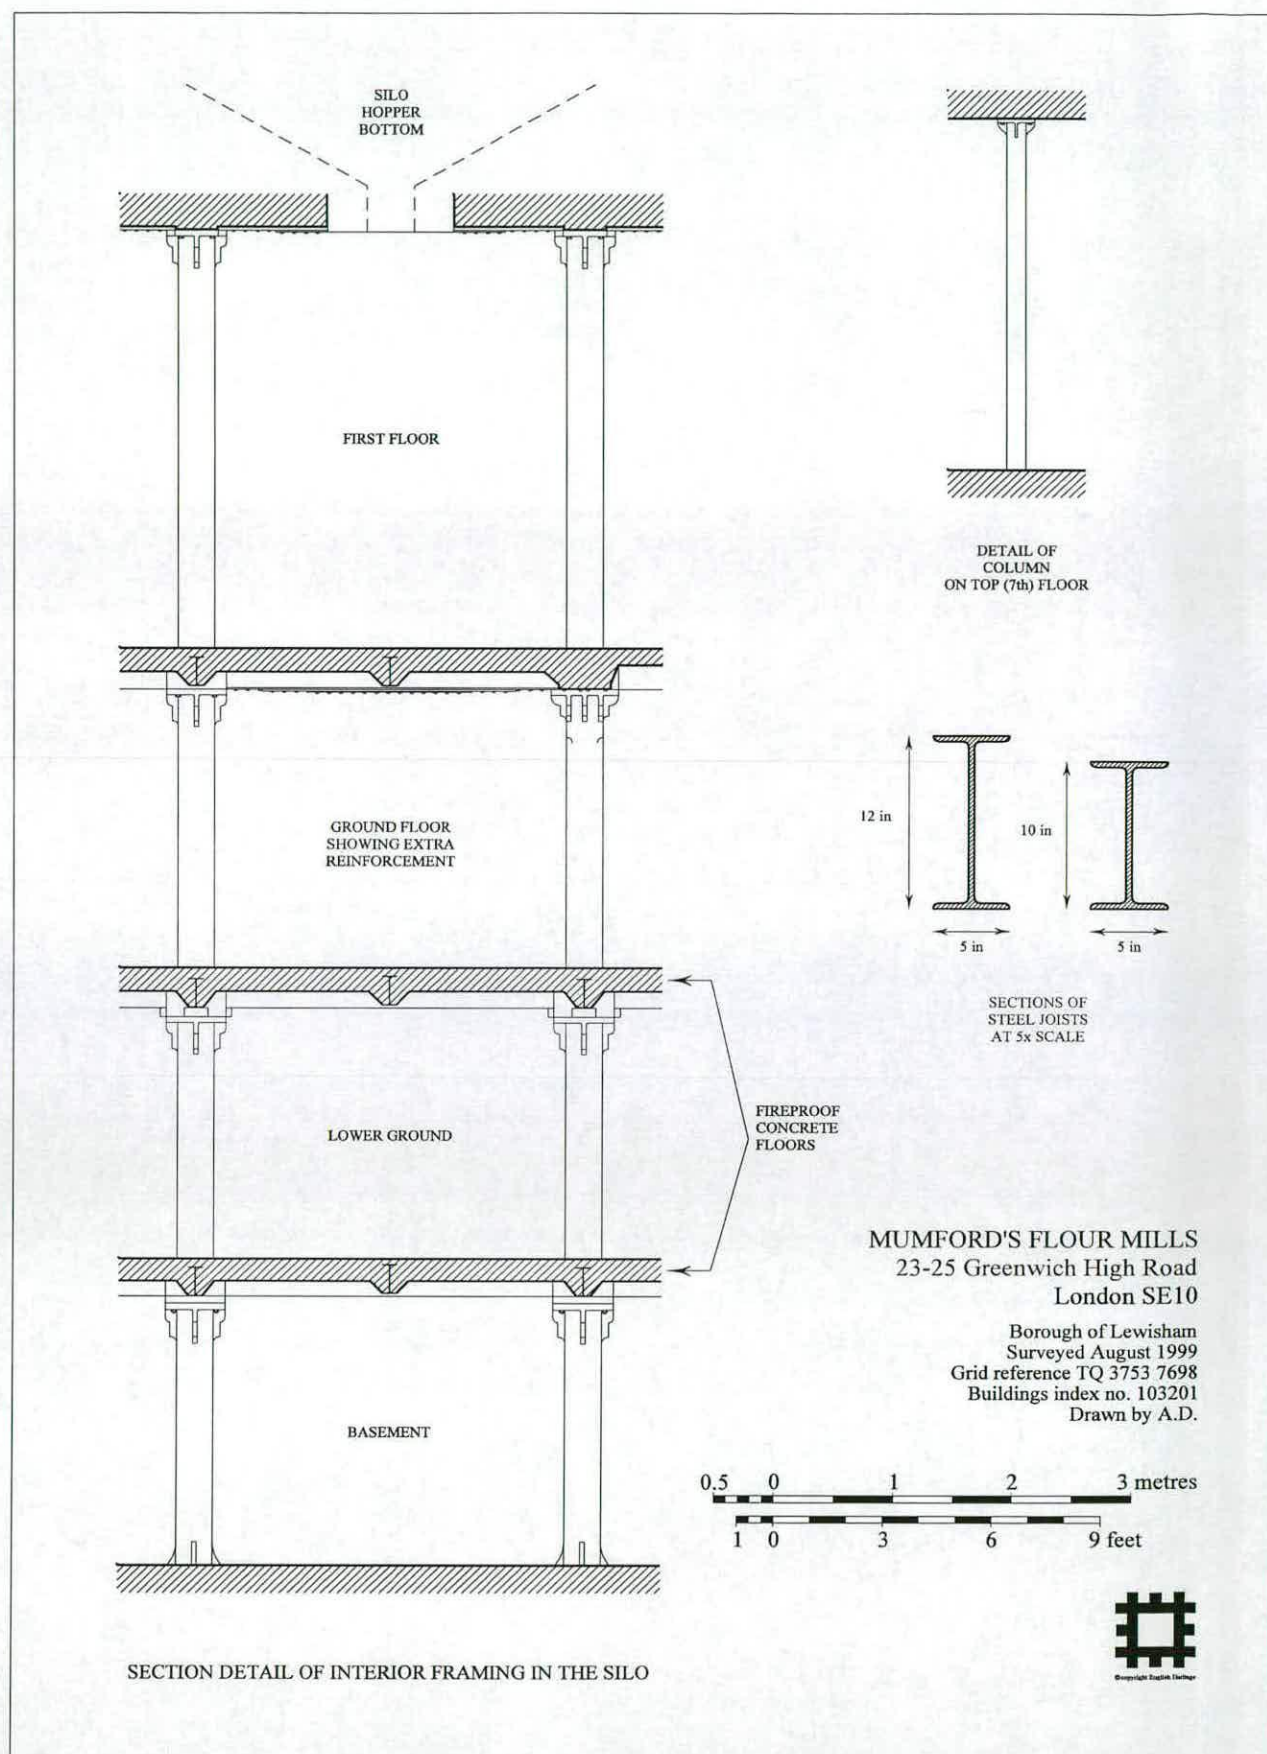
The Silo, section showing framing of lower floors and structural details.
